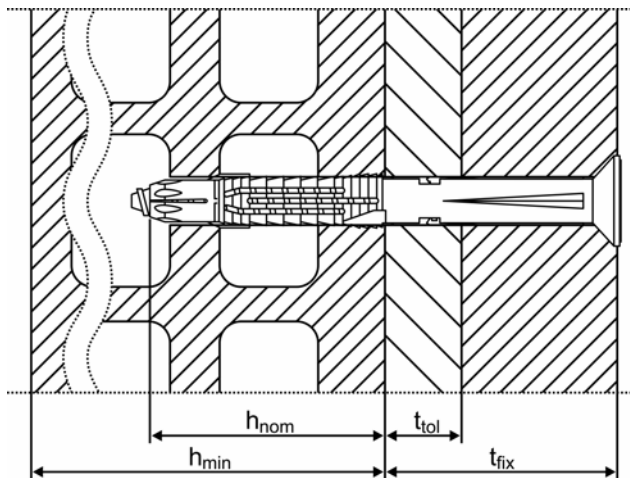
Installed anchor in hollow masonry in bricks ($h_{nom} > 70$ mm, $>$ of the dimension of the hole)
